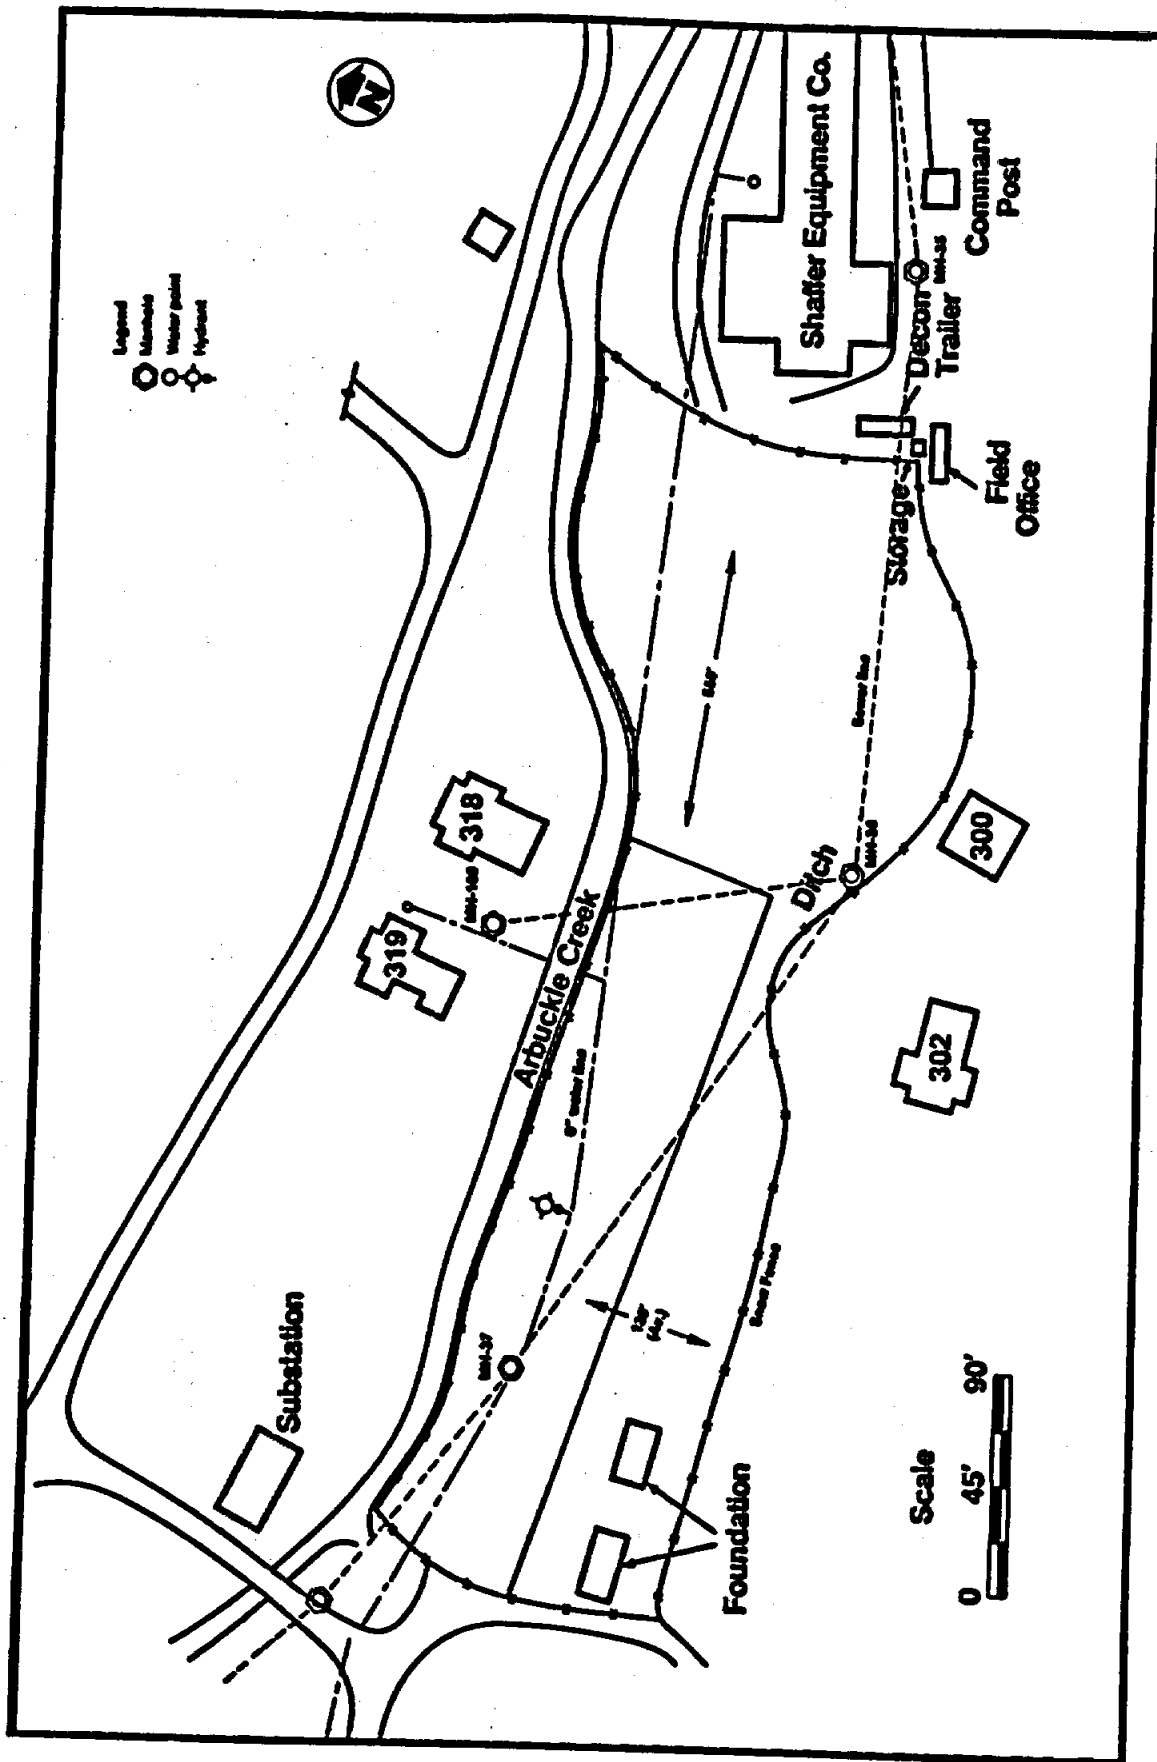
On site pipe/sewer line, Shafter Equipment Co.
